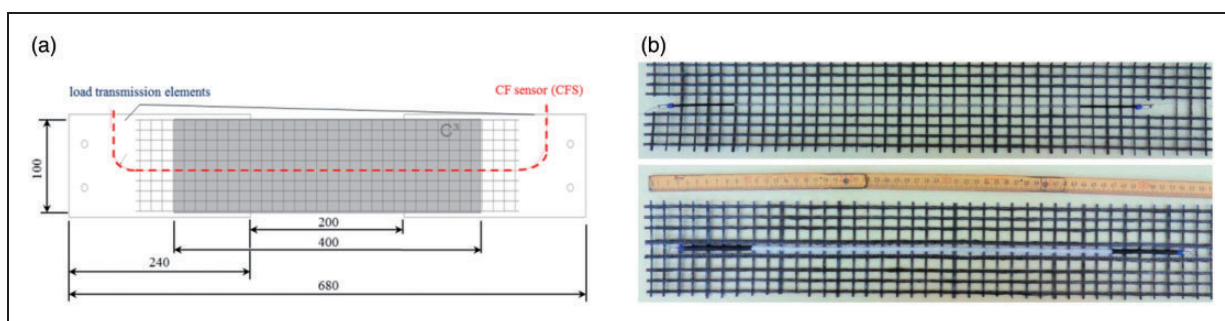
C^3 specimen dimensions of layout I in mm (a) and tailored carbon fiber (CF)-non-crimp fabric reinforcement structure ready-to-concrete-cast with electrical contacting on the type A-I (a) and type B-I carbon fiber sensor (CFS) ends (b).
